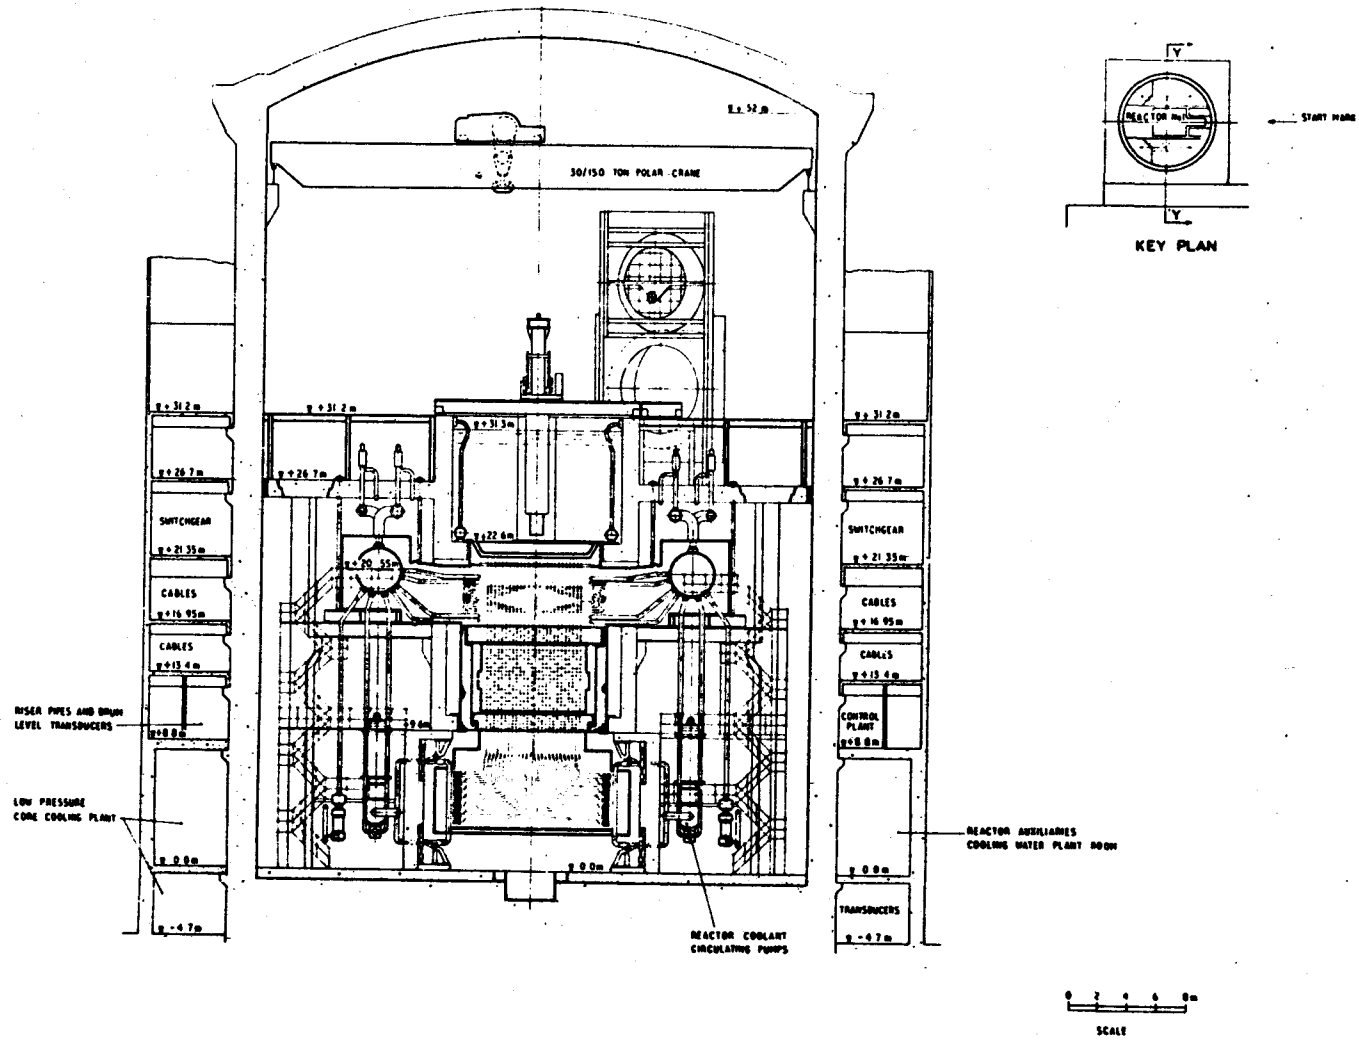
SGHWR BUILDING ELEVATION THROUGH PRIMARY CIRCUIT
